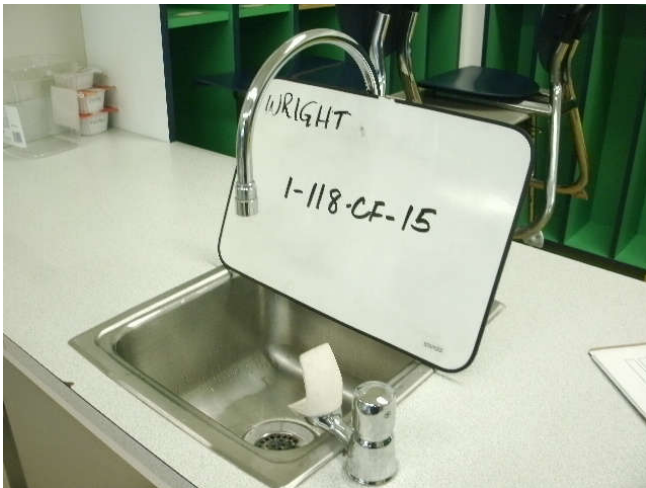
Classroom faucet w/bubbler, located on the 1<sup>st</sup> floor, in room 118.
